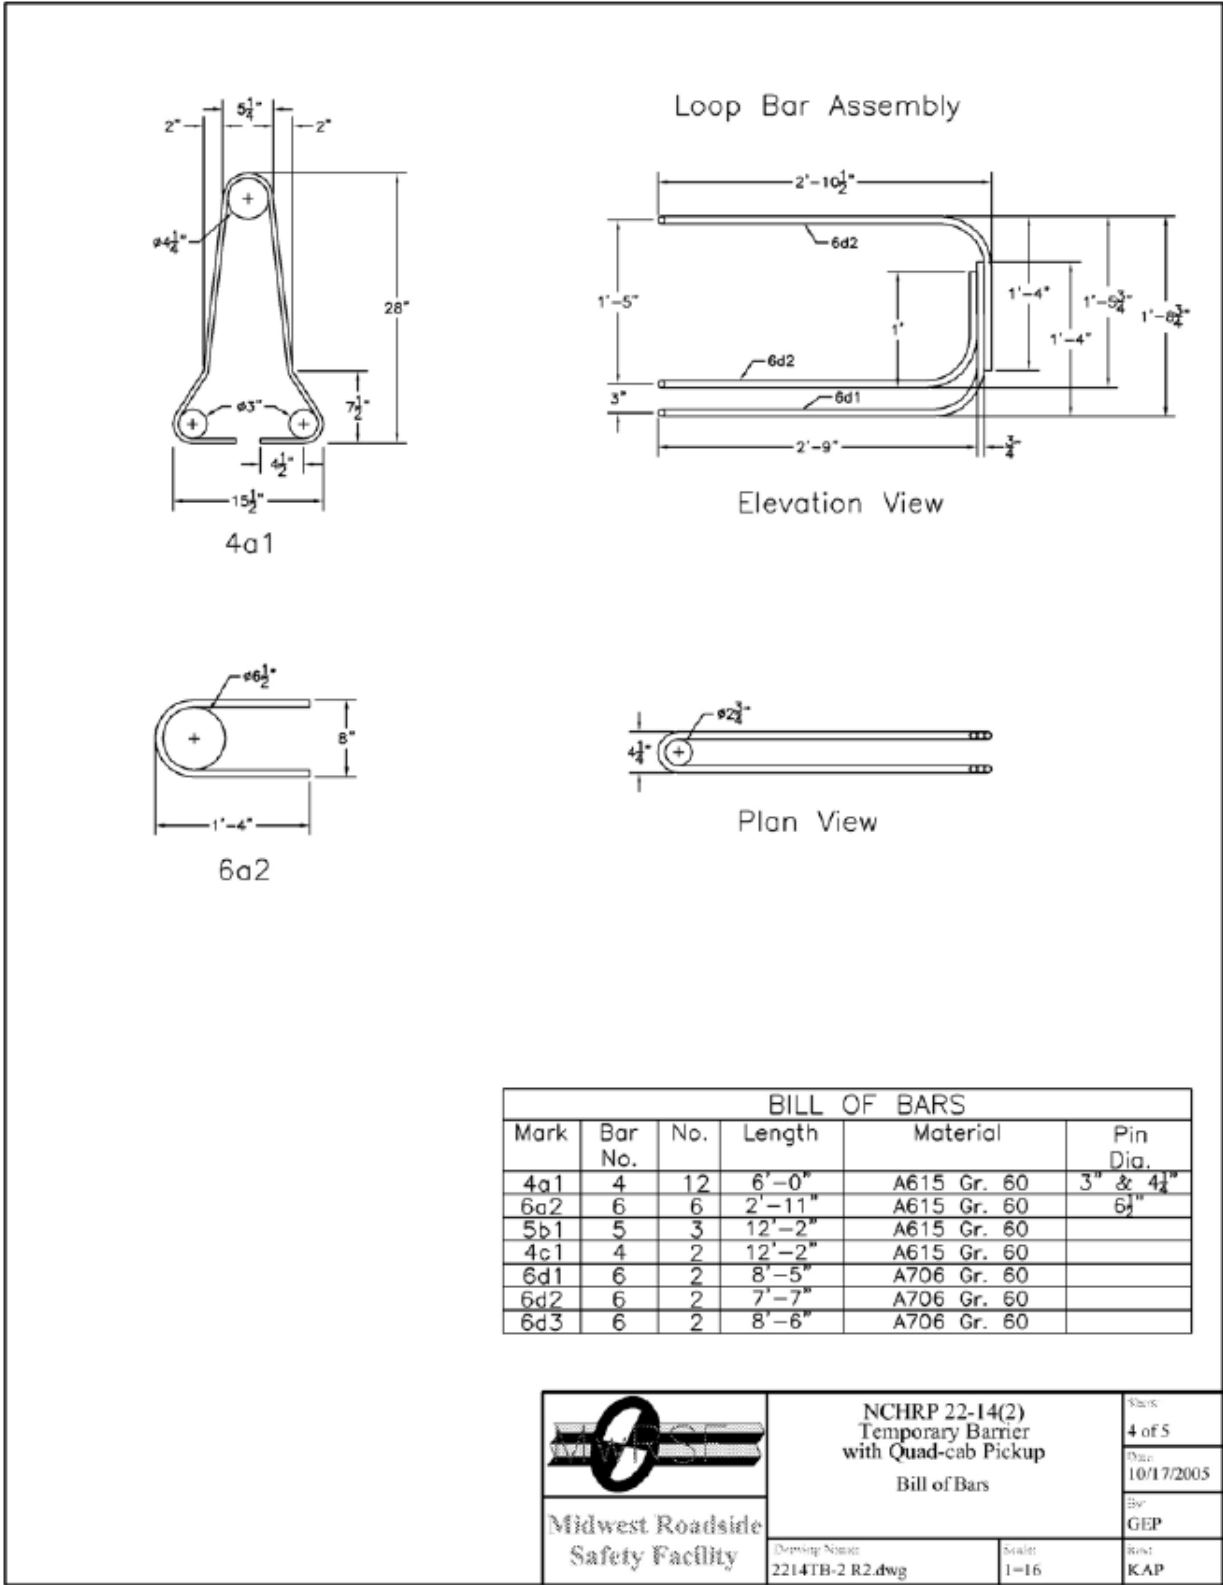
Details of F-Shape Barrier Tested to MASH TL-3 Cont.d.
